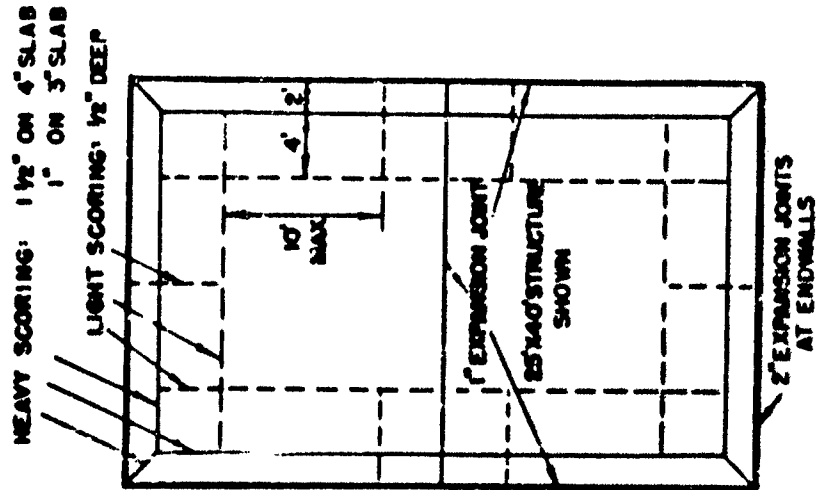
Recommended concrete floor scoring and expansion joint patterns.
